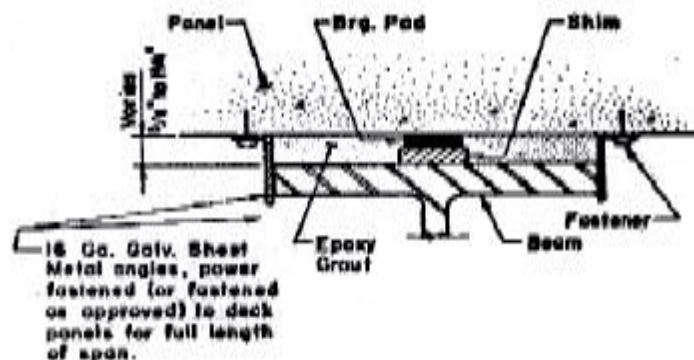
Cross section of the deck at a girder line showing the details of shimming and grout barriers
